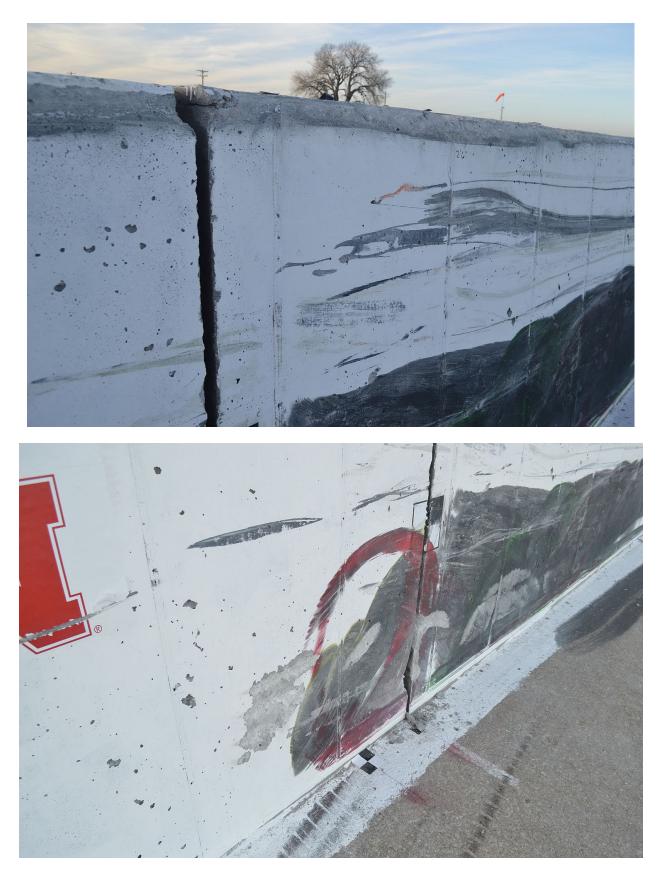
System Damage Near Expansion Joint, Test No. MTL6-1
